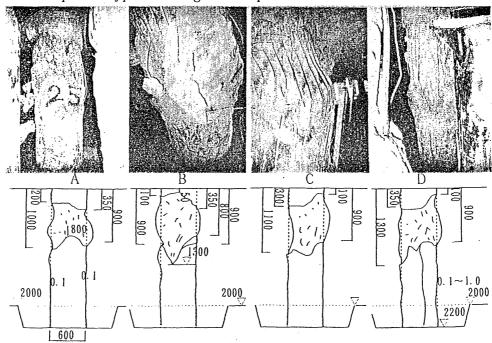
Photographs and Sketches of the Four Mutually Perpendicular Sides of the Top of a Typical damaged PHC pile
